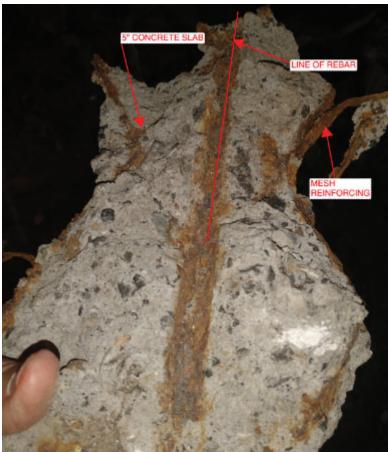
Piece of terrace slab showing rust stain from a rebar and rusted steel mesh.
